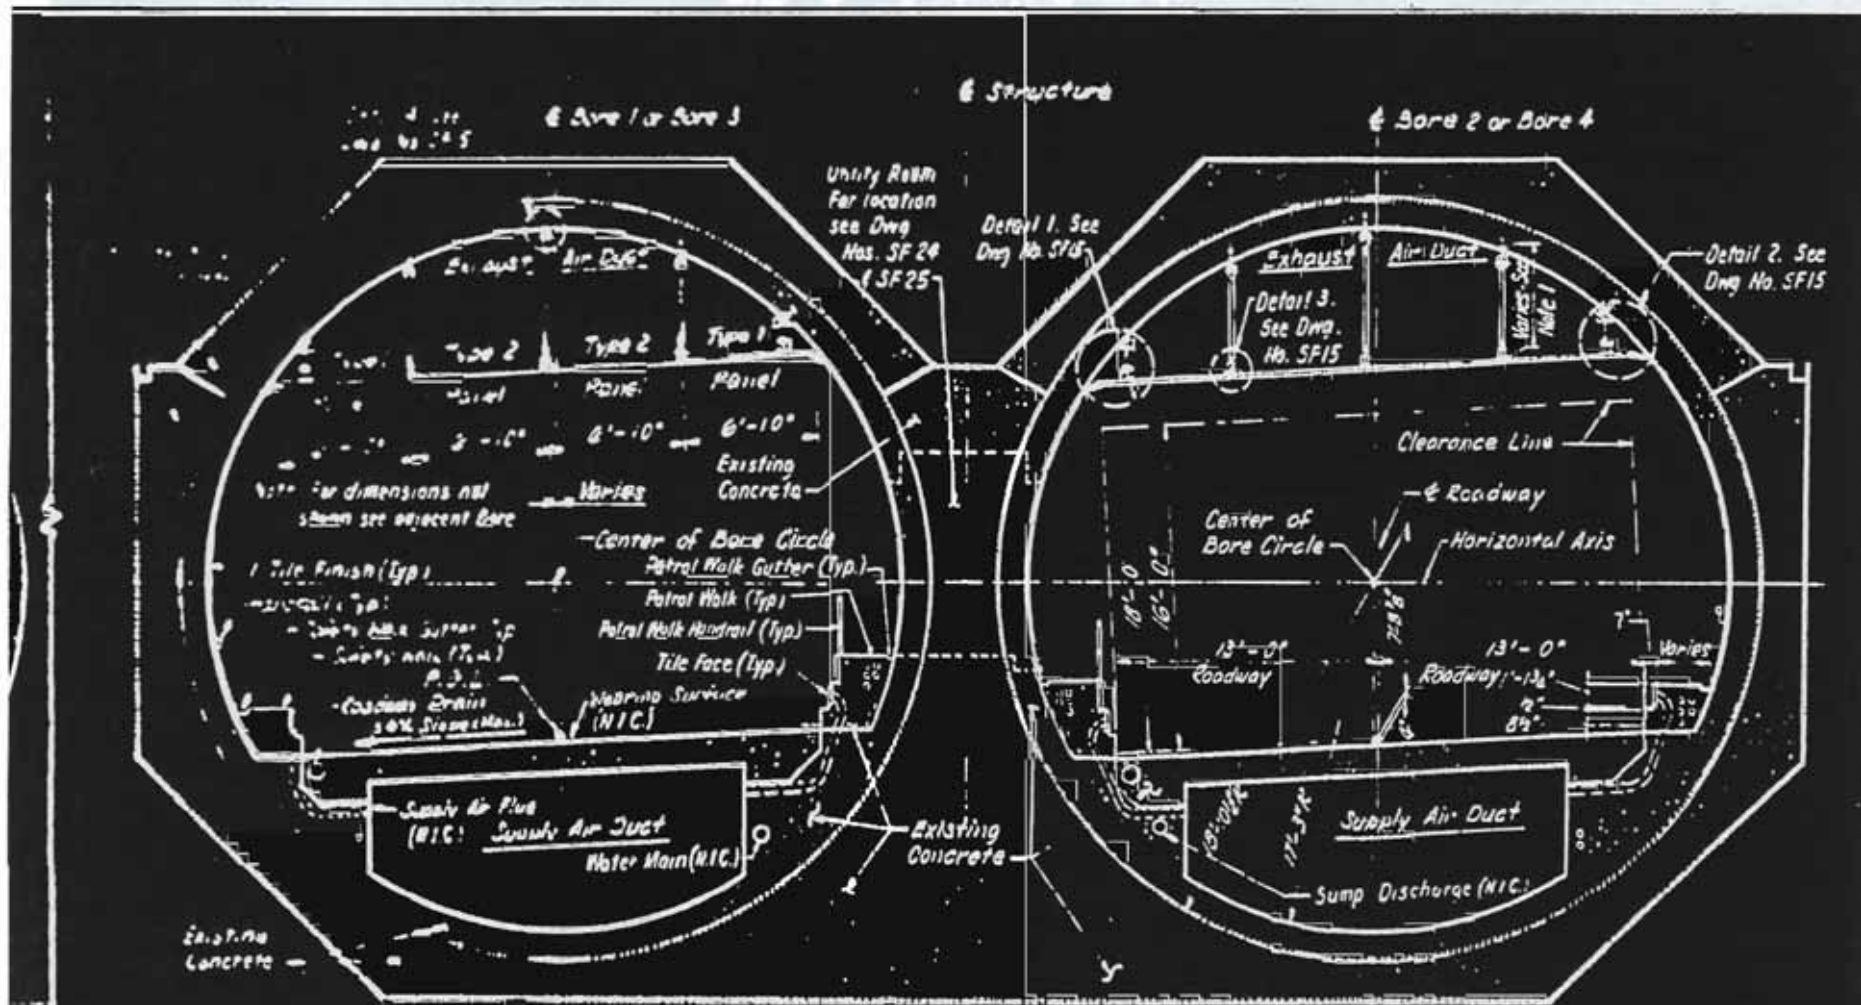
TYPE 4 TUNNEL CROSS SECTION
